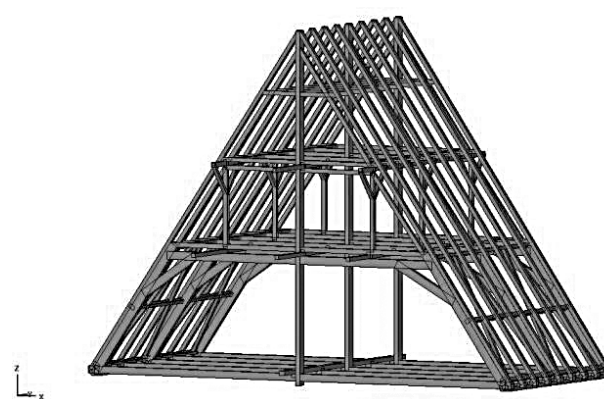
d. – 3D – Axis 8 VM model of the roof structure of the Kogălniceanu street Reformed church, Cluj-Napoca
